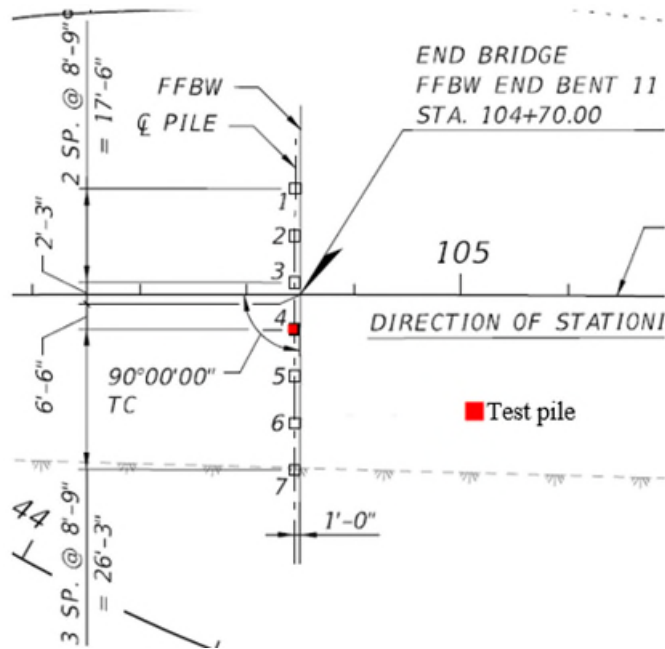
Detailed typical plan view of foundation layout at site labeled herein as A3.
